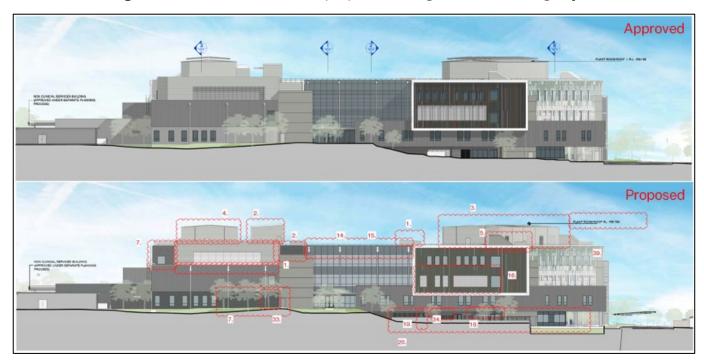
| Approved and proposed northern elevations (Source: Architectural Plans)
